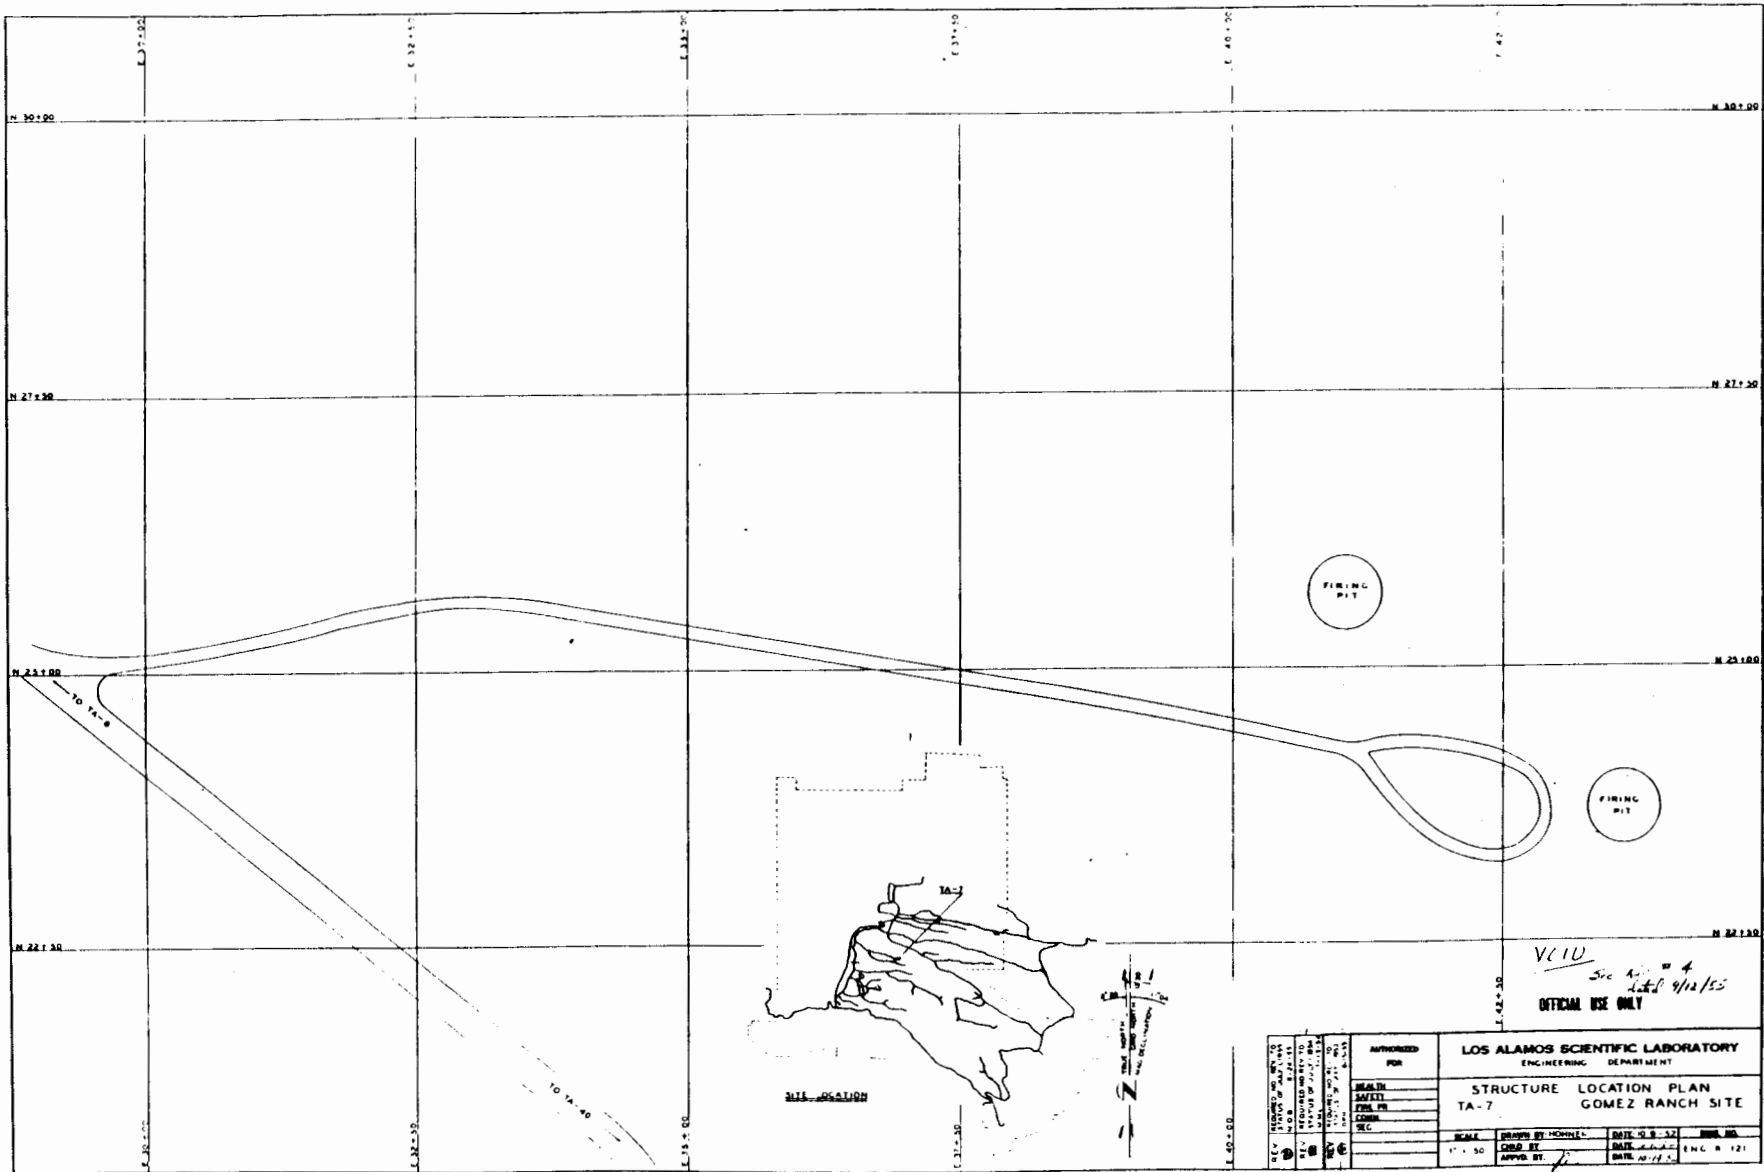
Structure Location Plan for TA-7 - Gomez Ranch Site (1952 Drawing from the LANL Technical Area Structure Location Plans)
